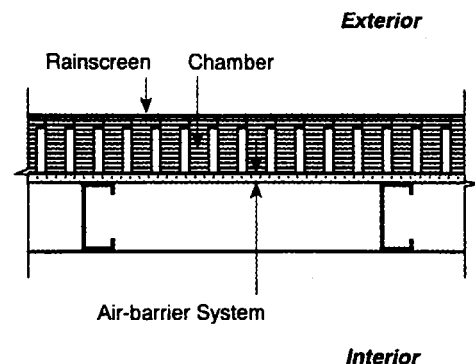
Horizontal section of EIFS wall test specimens (specimens 3 and 4)
